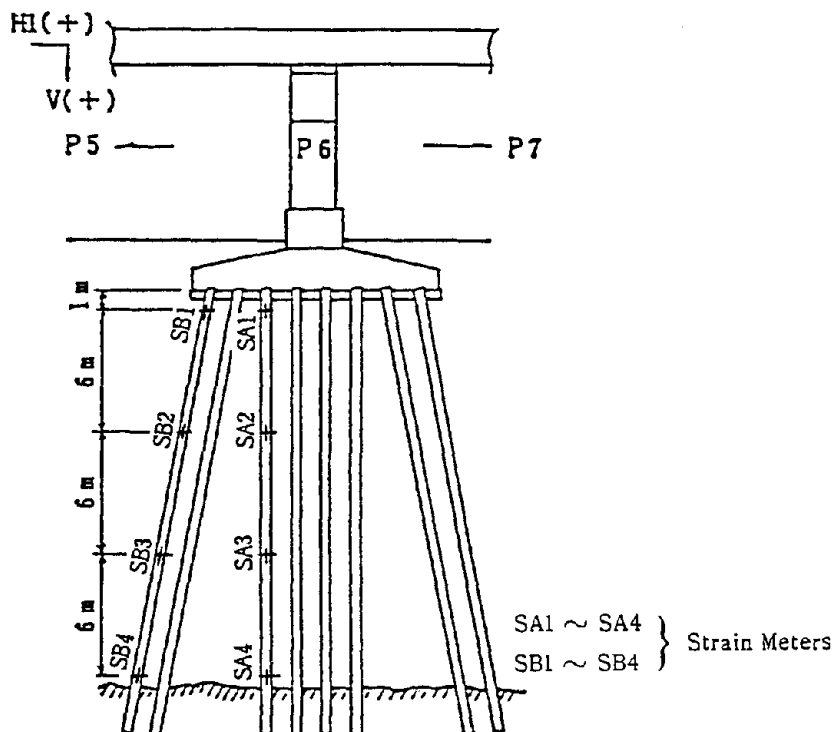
Bridge pier and its pile foundation at which seismic observation was carried out
